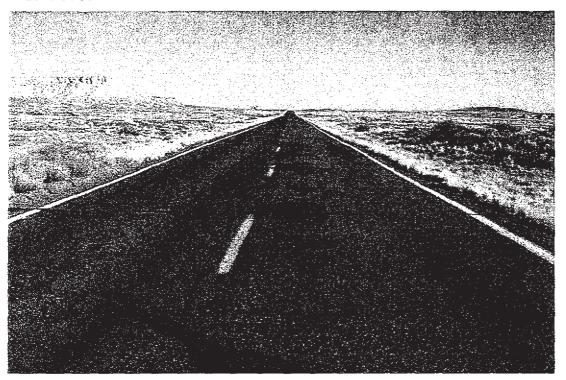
MP 0.40 - Typical Pavement Section, Note Full width Transverse Cracks
